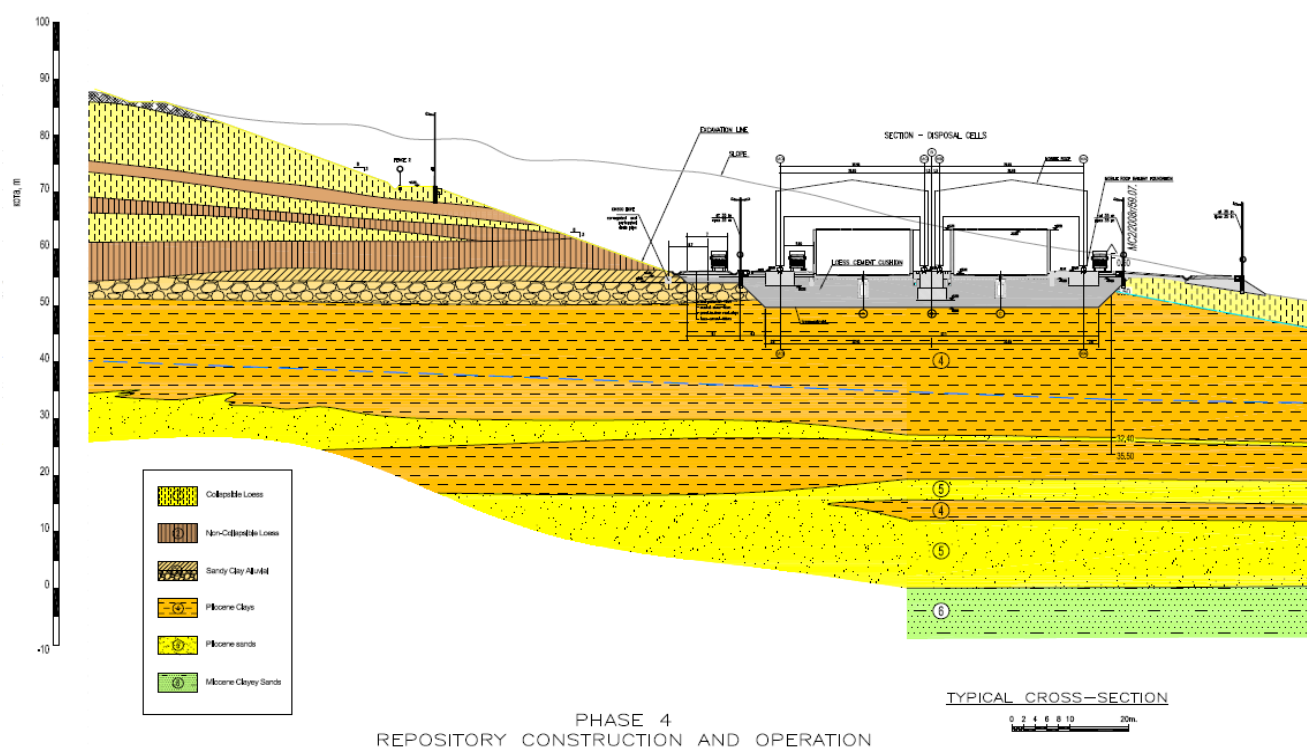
GEOLOGICAL CROSS SECTION OF LOCATION OF A TRENCH-TYPE REPOSITORY
